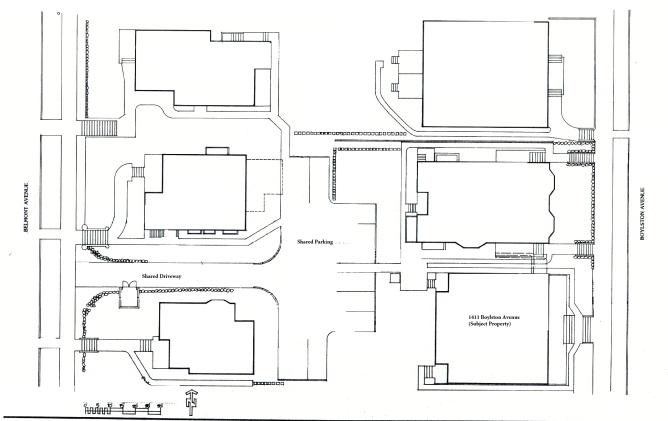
Site plan of Bel-Boy houses showing relationship of sites, shared driveway off Belmont. 1411 Boylston Ave is at the lower right, edited from Stickney & Murphy site plan.
